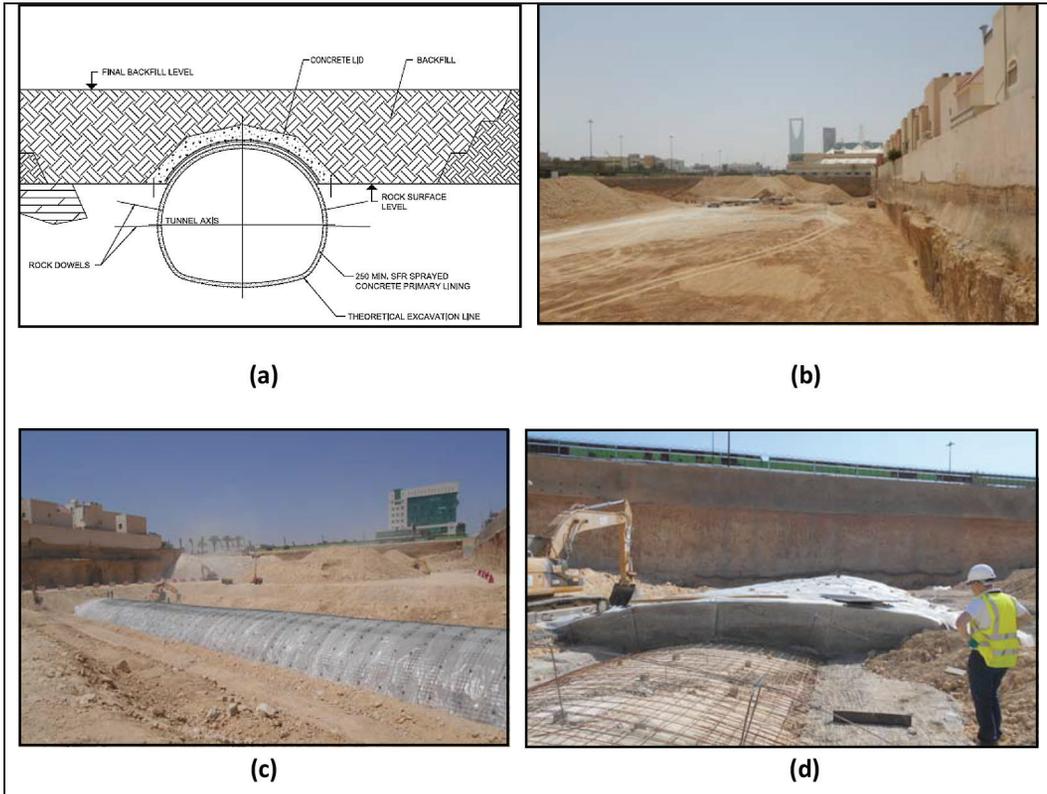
Construction of west tunnel section within the open cut area: (a) tunnel configuration with respect to backfill and canopy lid, (b) open cut area before tunnel excavation, (c) backfill with PVC above the tunnel section, and (d) tunnel concrete canopy
